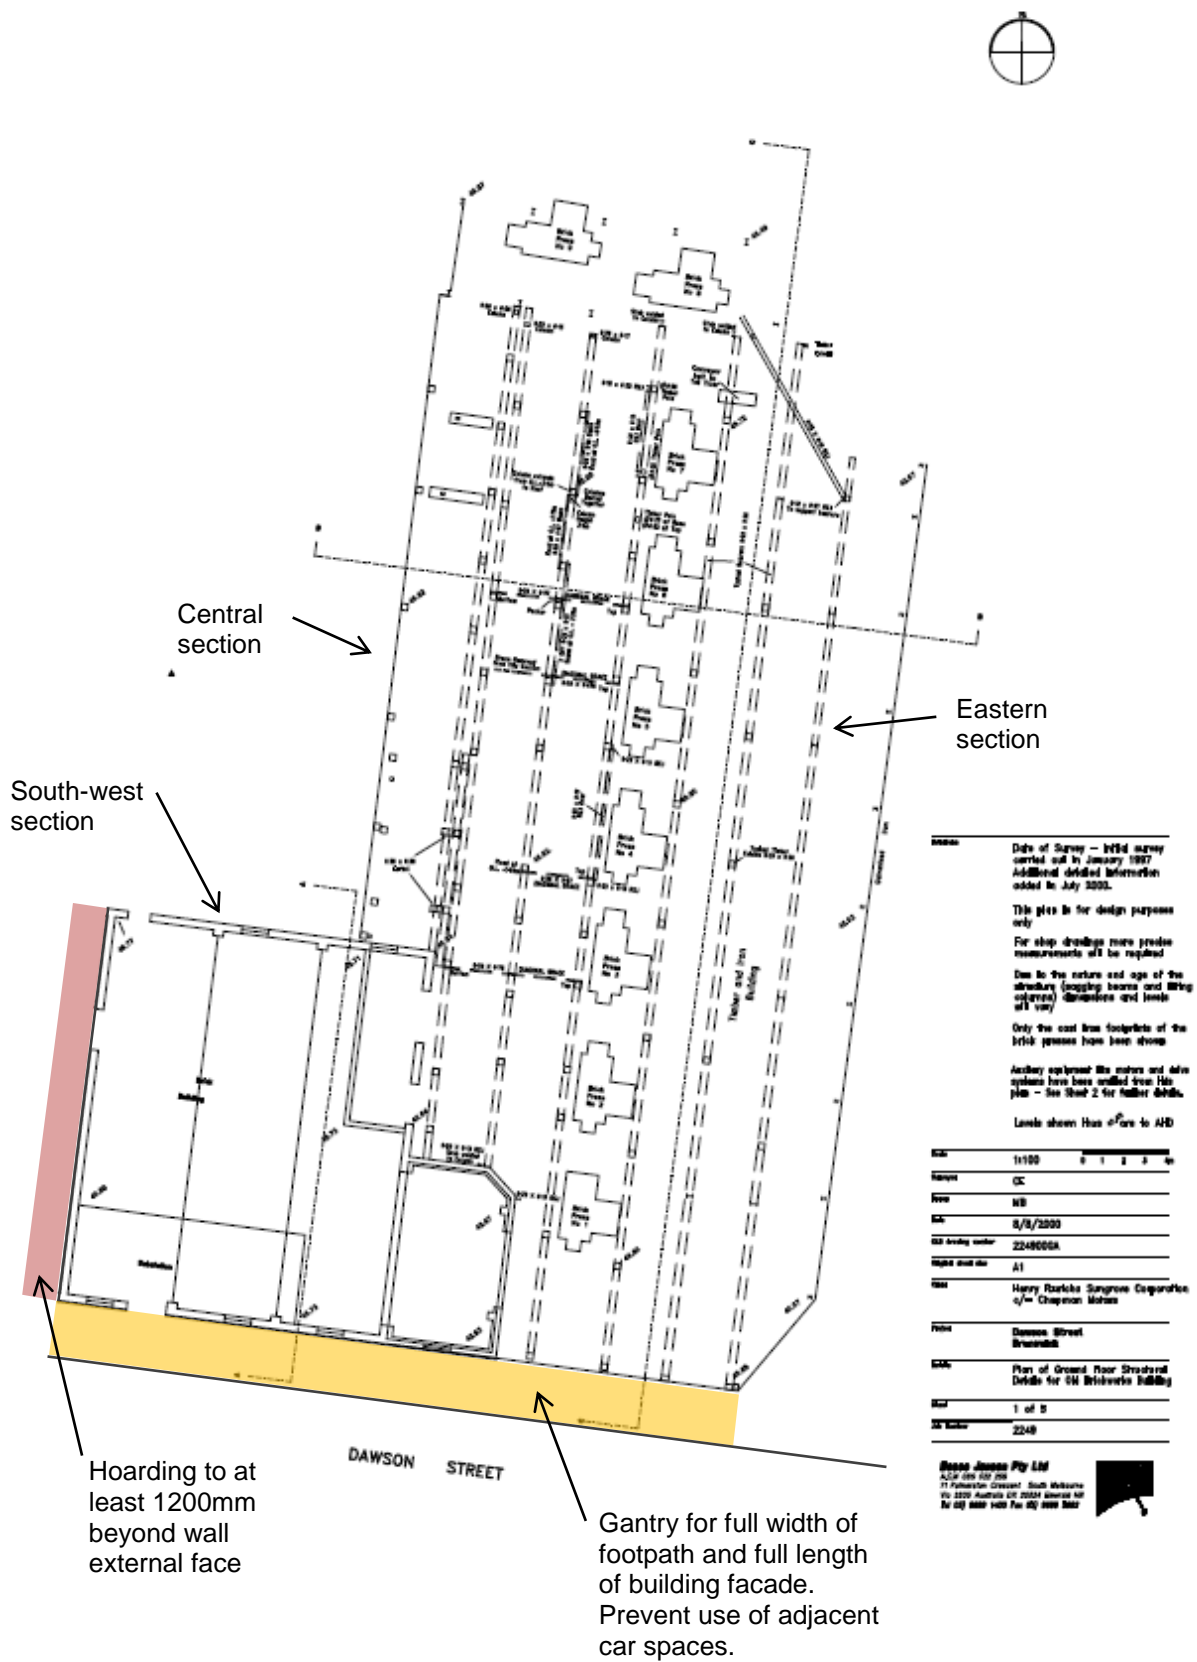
Temporary Hoardings / Gantries to Former Brick Press Building
